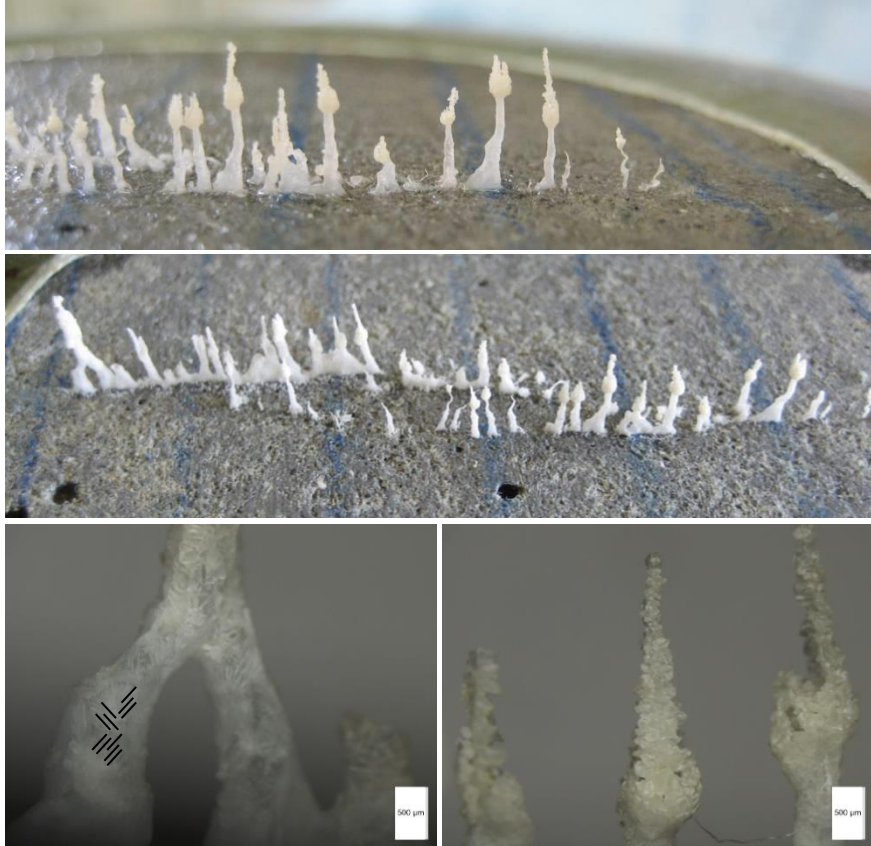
Formation of stalactites with a maximum height of 11 mm after a low-pressure water-permeability test at the outlet of the crack of a specimen containing SAP B. The scale bars amount to 500 µm.
